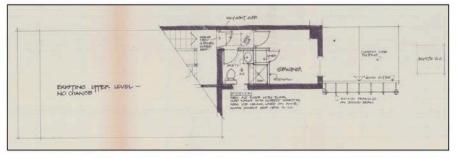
Proposed first-floor plan. J. Greenwood (1984). Inner West Council Archives
